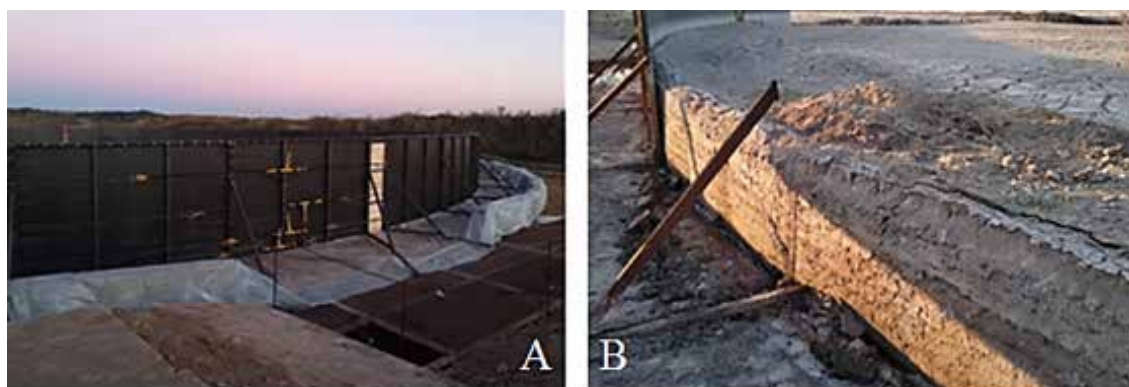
The general view of open air filter pool for drilling wastes filtrating (A) and the dry residue after liquid phase removal (B)
